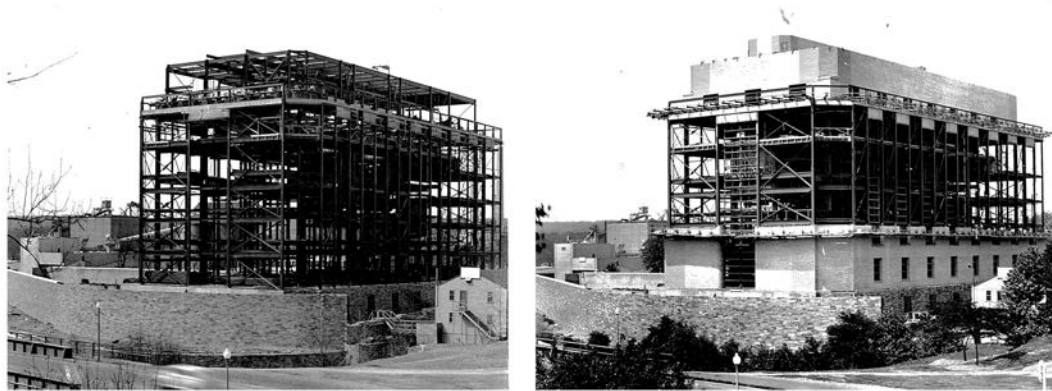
Photos from the plant’s construction show the brick skin wrapping the steel frame
